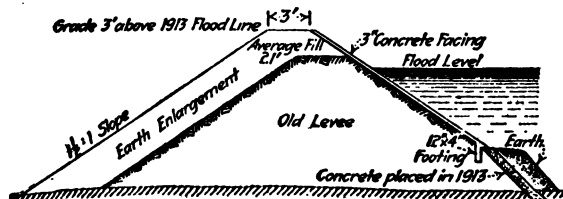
Wabash River Levee Showing Earth Enlargement and Concrete Facing.
